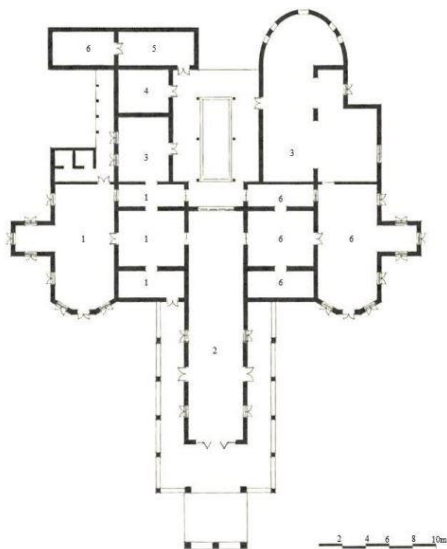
Plan of Manor – Certified School at Hikkaduwa [Drawing] (Source – By Author)
